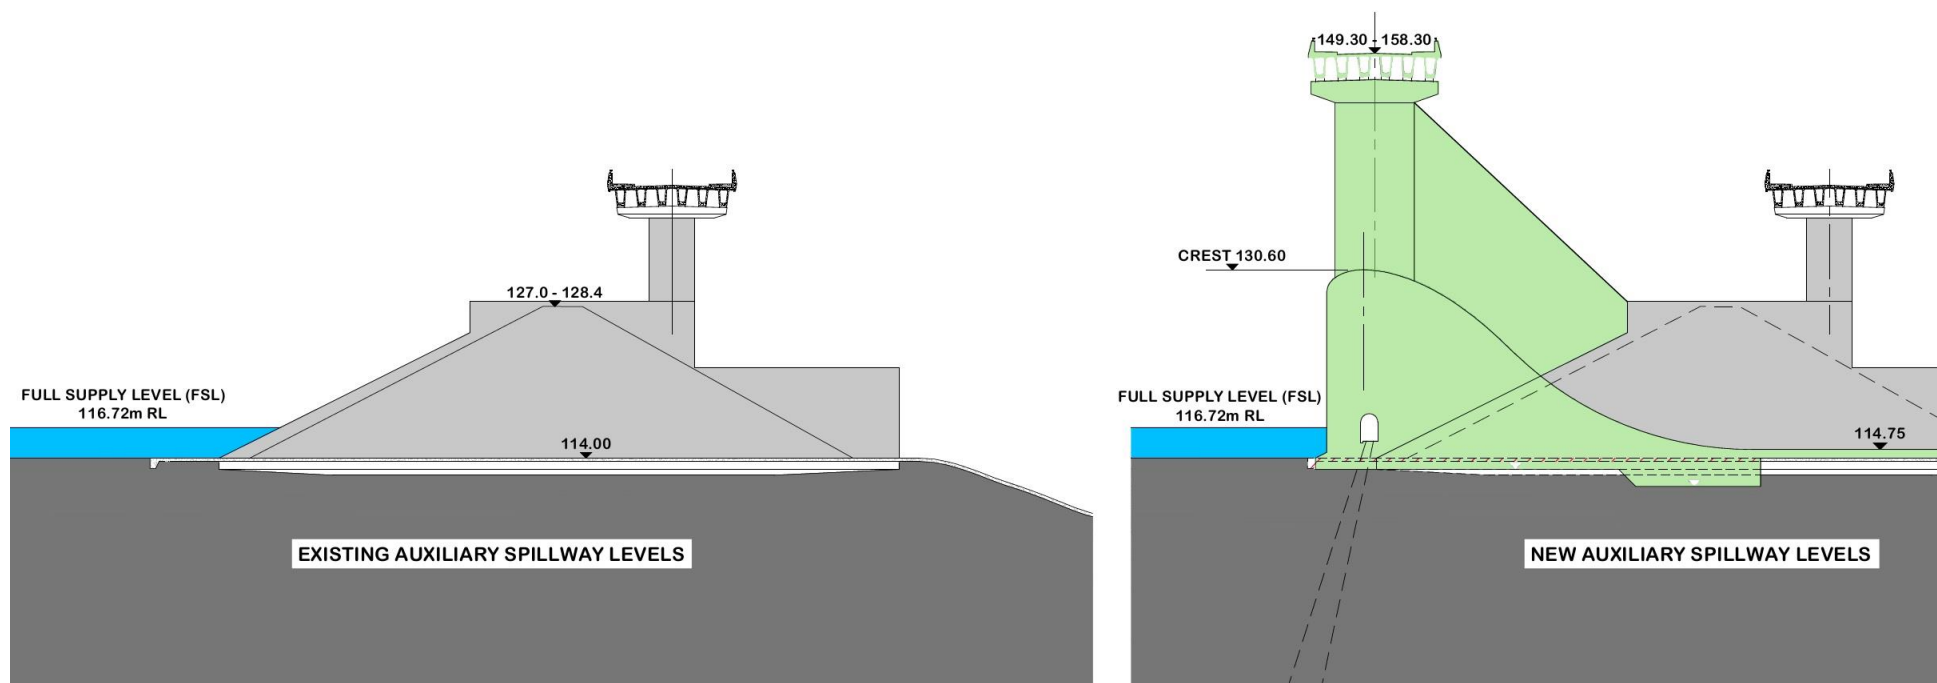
Cross sections of existing and modified auxiliary spillway crest
